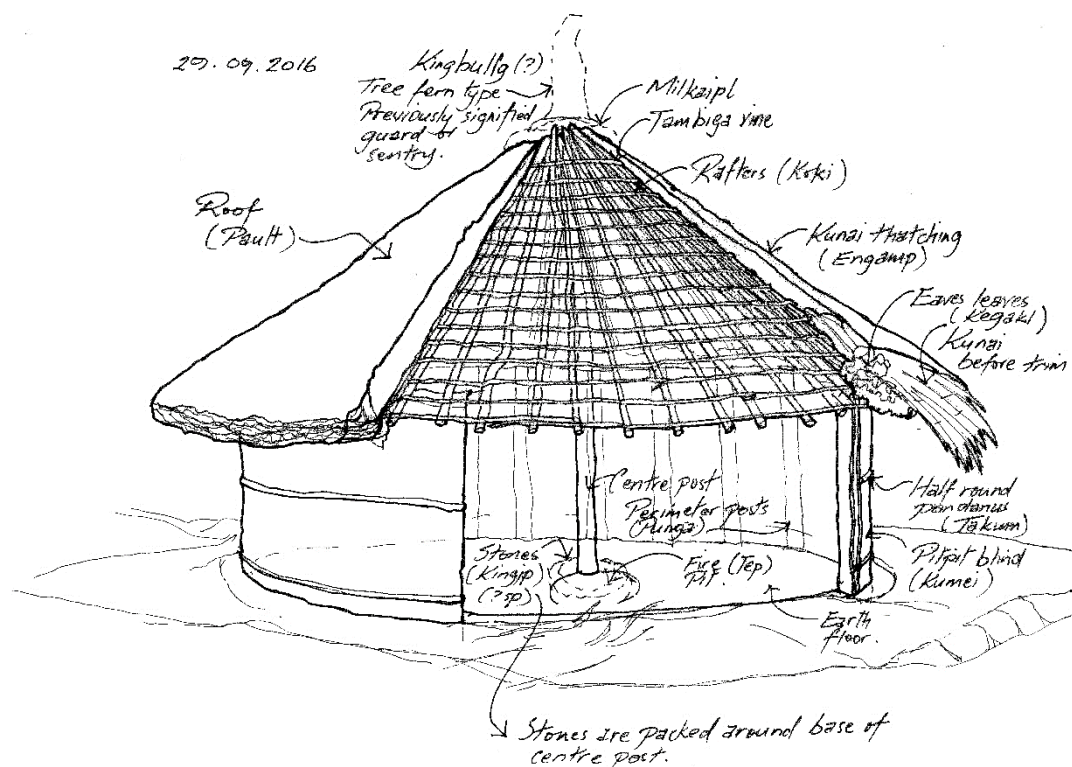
Field sketch. Cross section of Haus Man 2016.
